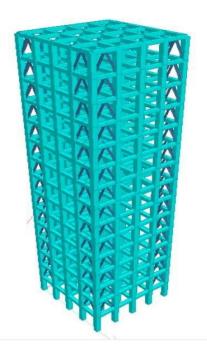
(a) Structural Plan for Inverted Vbraced RC Frame (Model-5)
